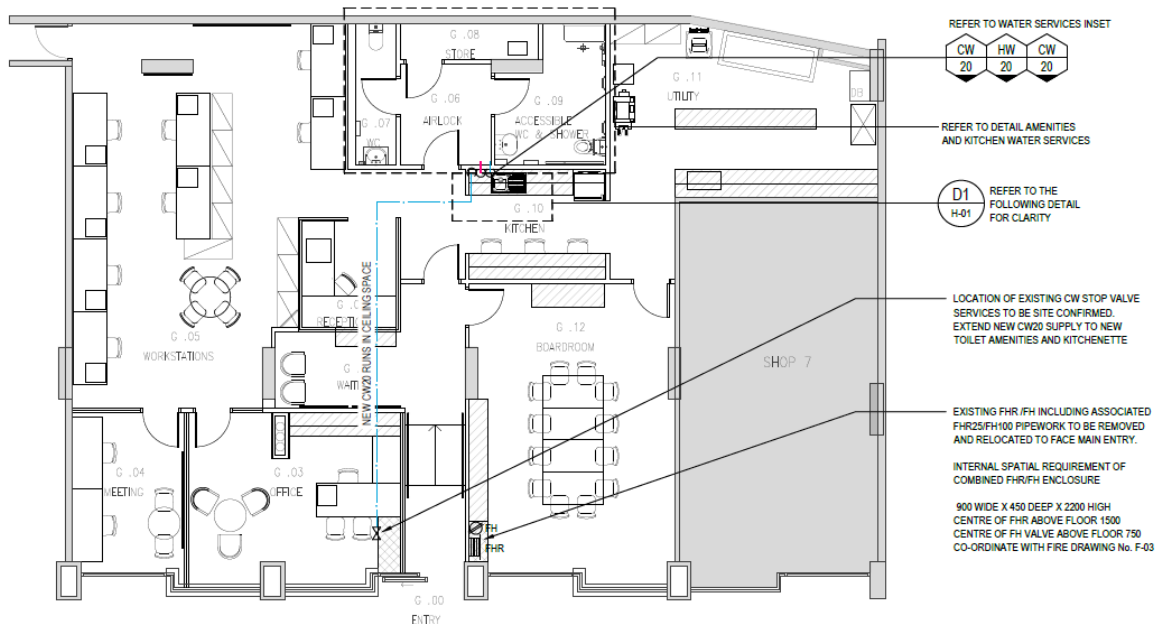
Hydraulic Services Plan (Source: VOS Group 2023)
